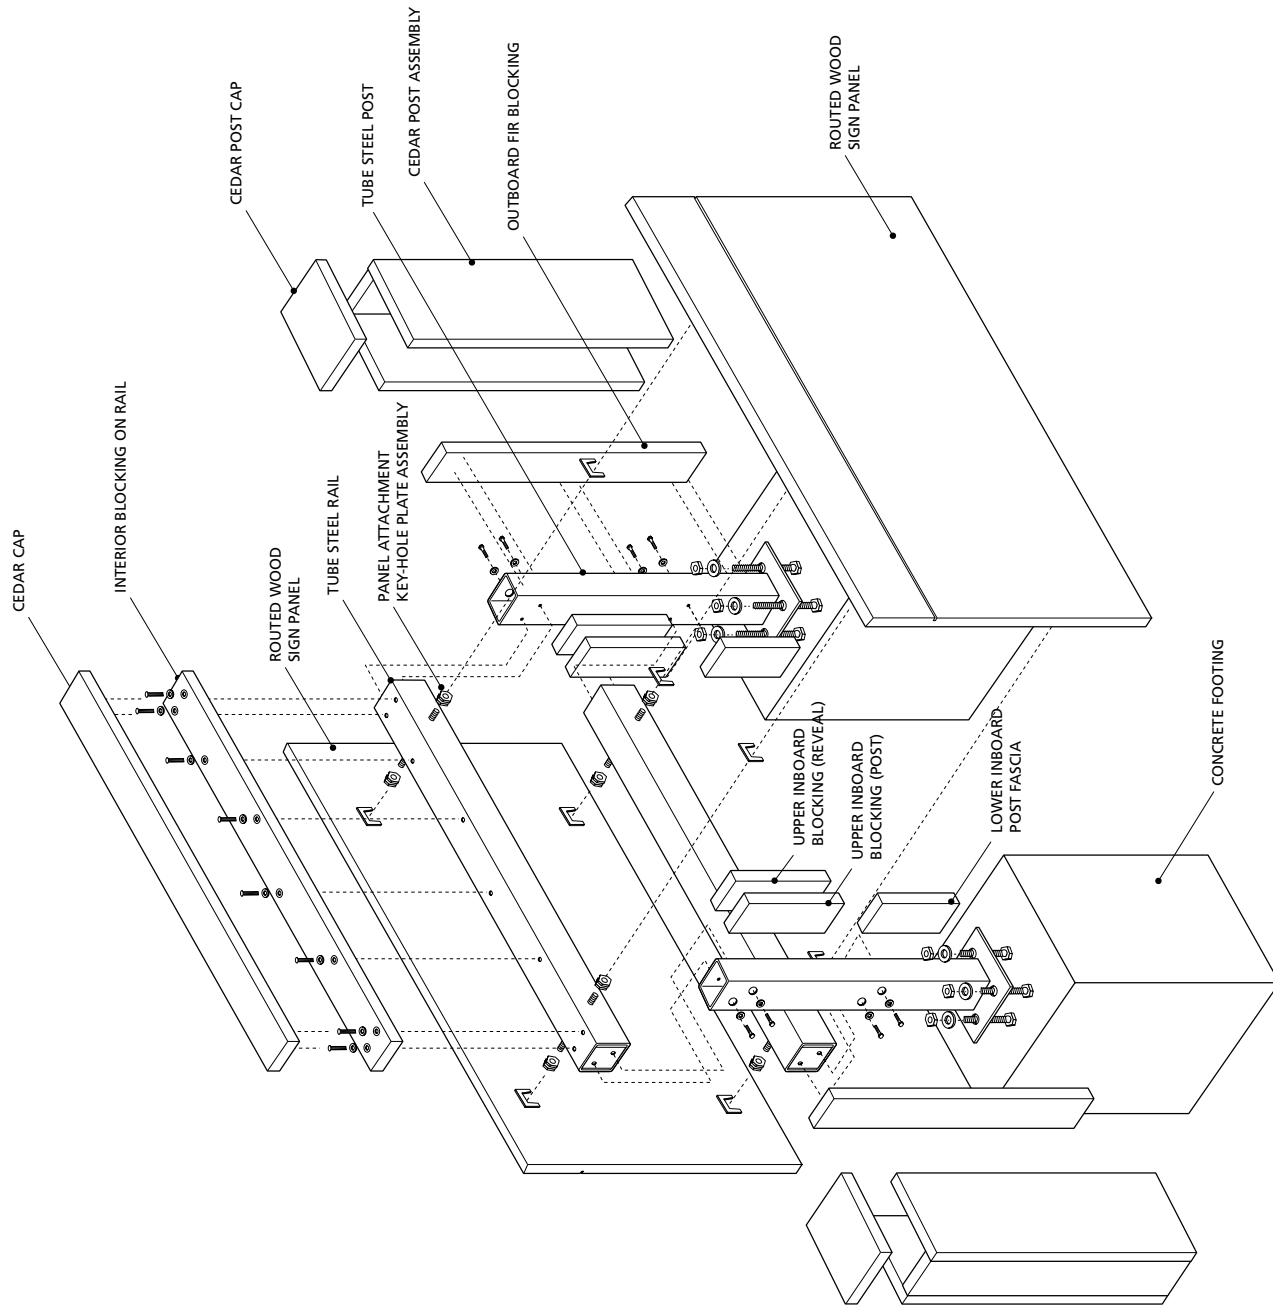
DETAIL E. WOOD RAIL ASSEMBLY PLAN VIEW
